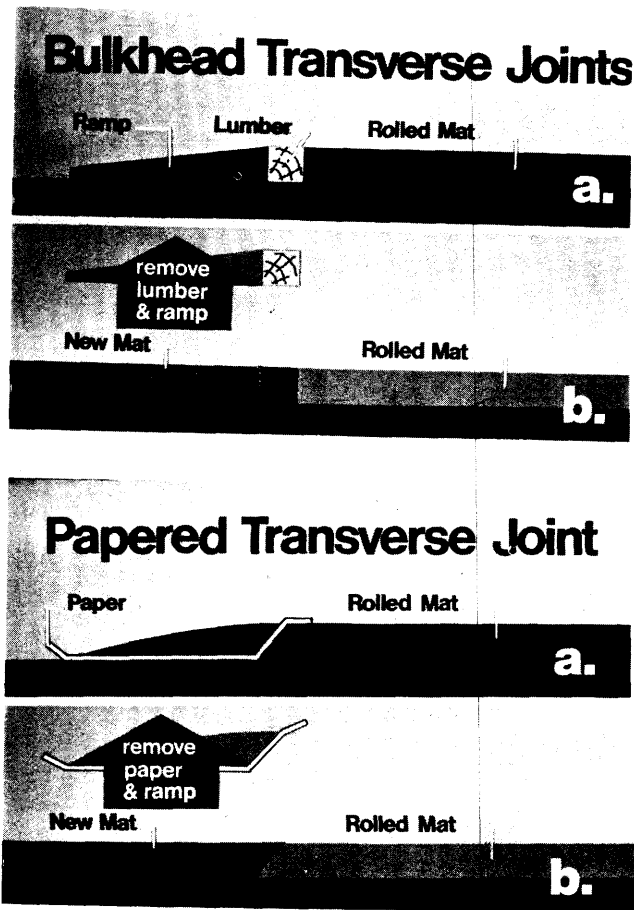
Using Wrapping Paper (A) or a Board (B) to Form a Transverse Joint.
